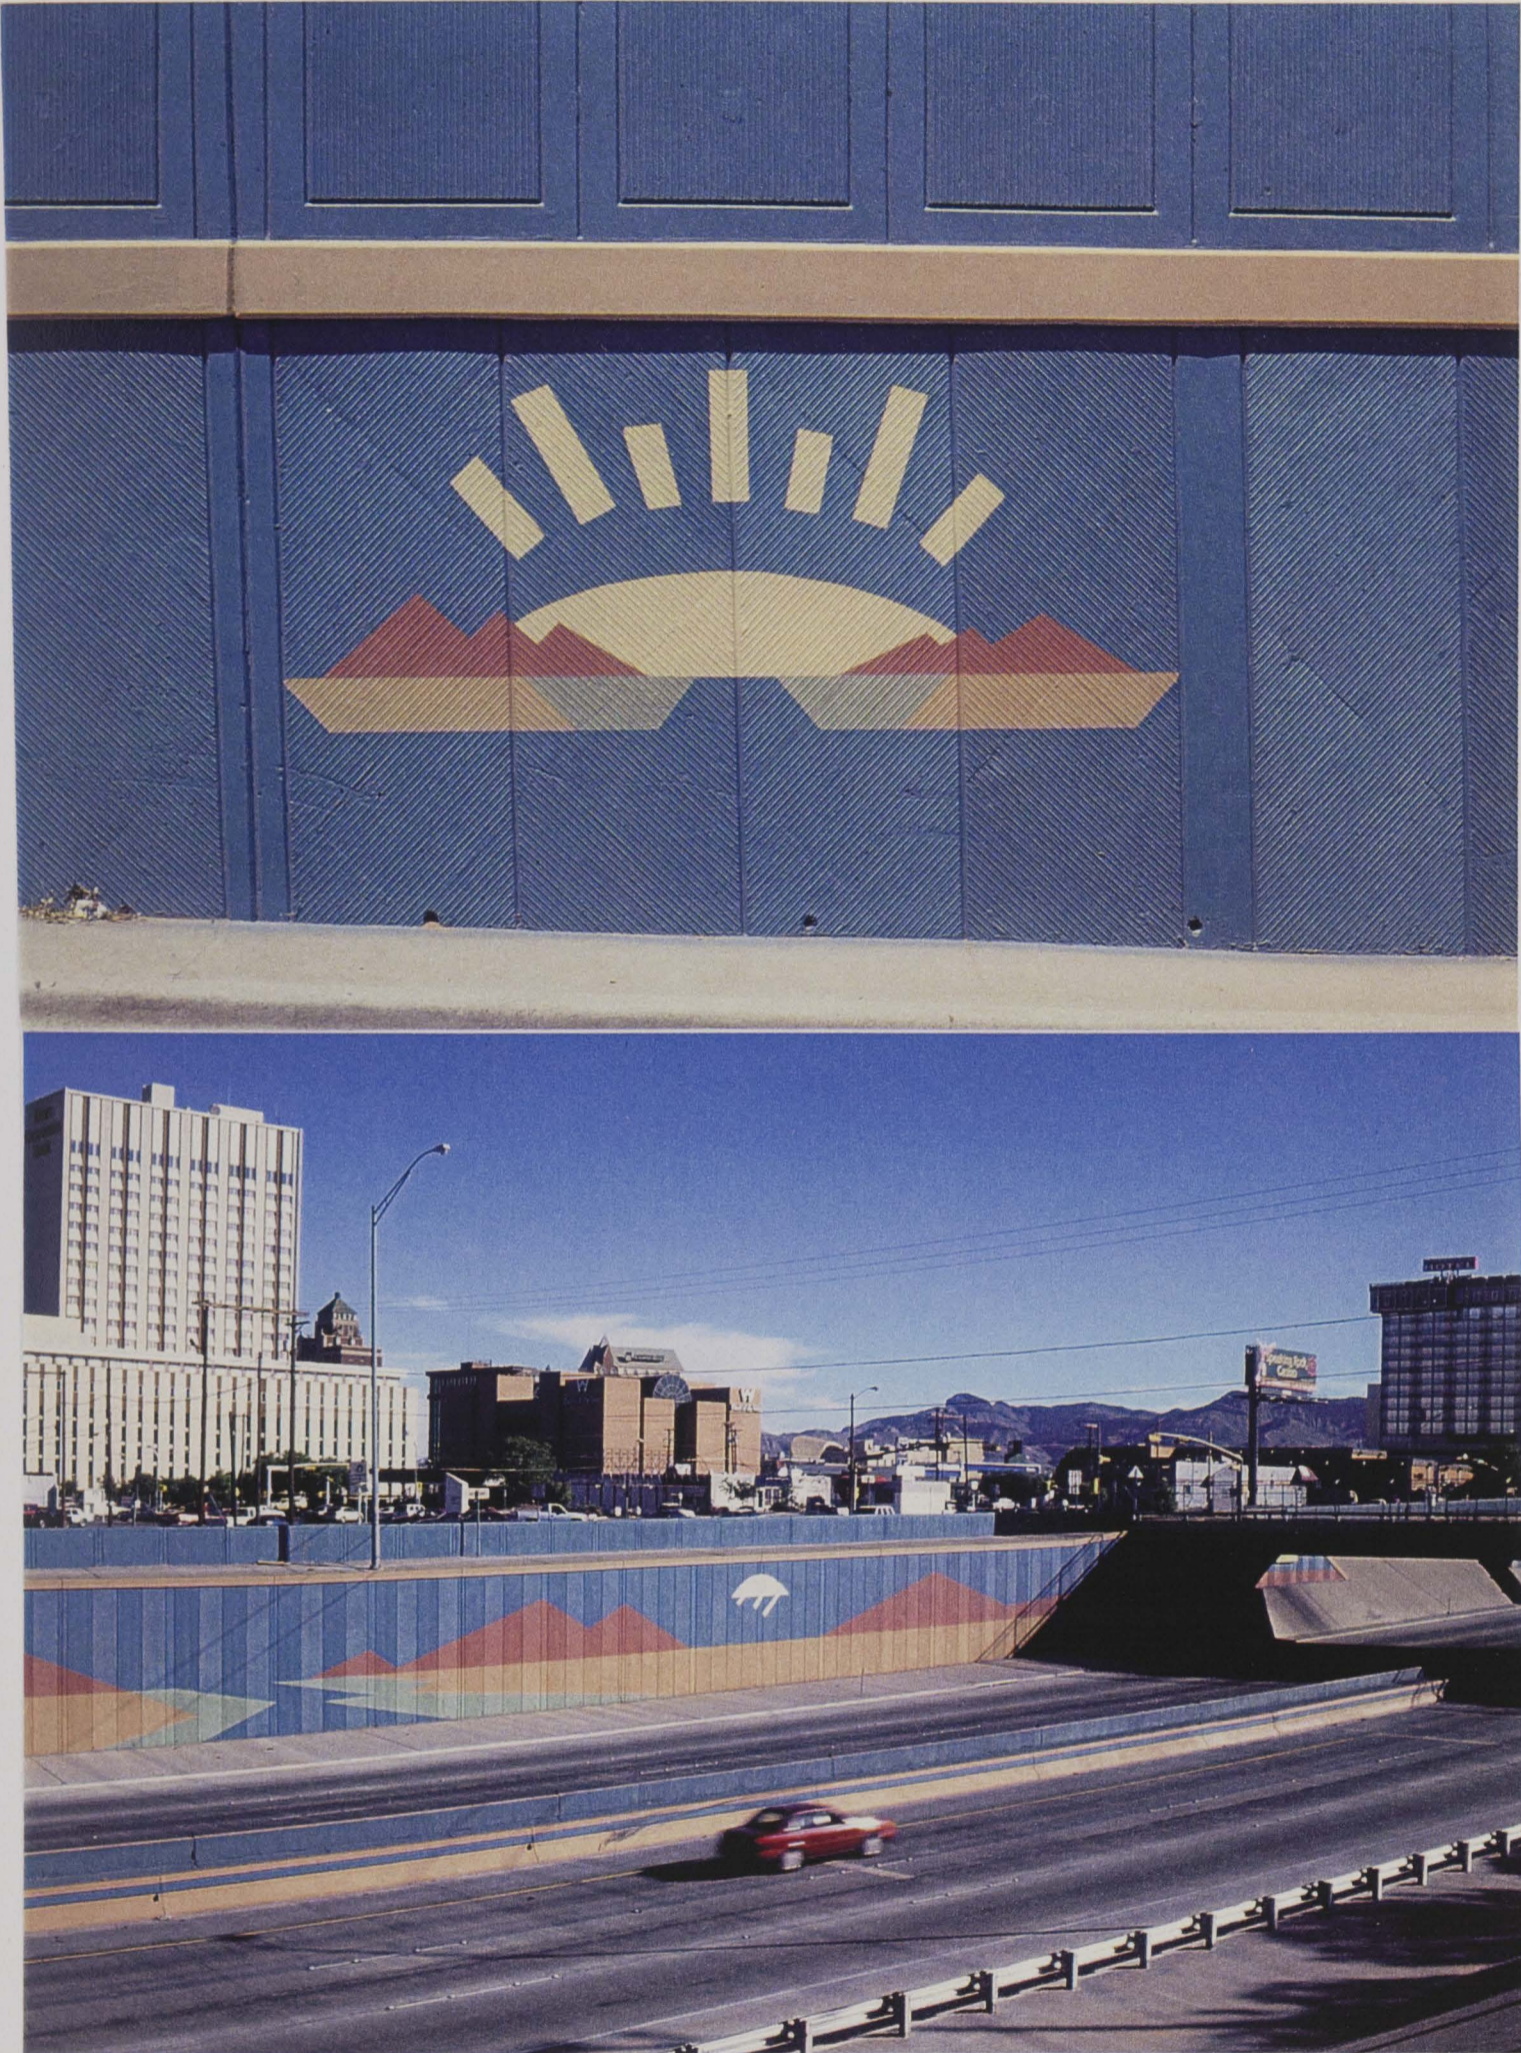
& 30: IH-10, Downtown, depressed canyon, murals on retaining walls
